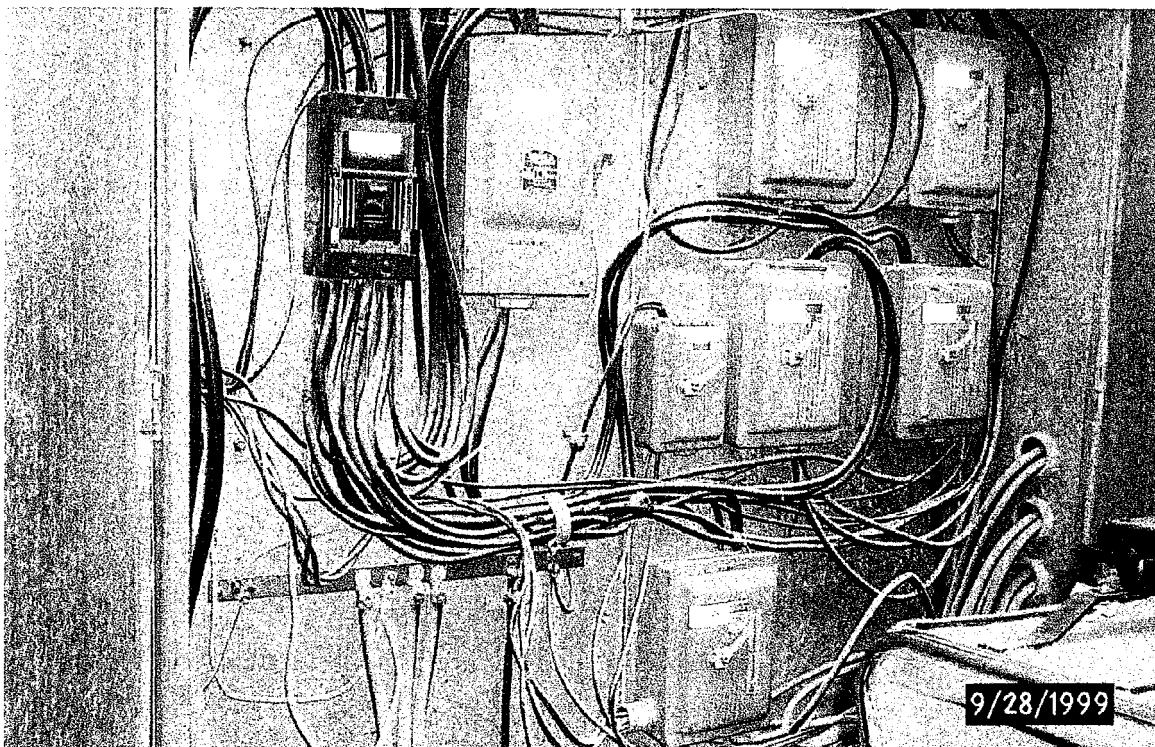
Multiple Fuse Disconnects in Maintenance Building – Several of the Switches are Obsolete (All of these will be Replaced with One New Panelboard in Proposed Upgrade)
